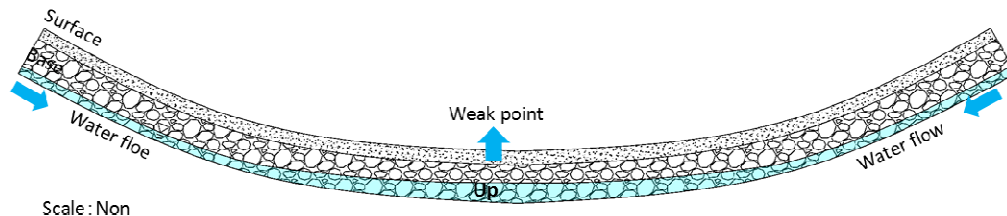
Flow of the water at Sag point (Mechanism of the pavement failure)
